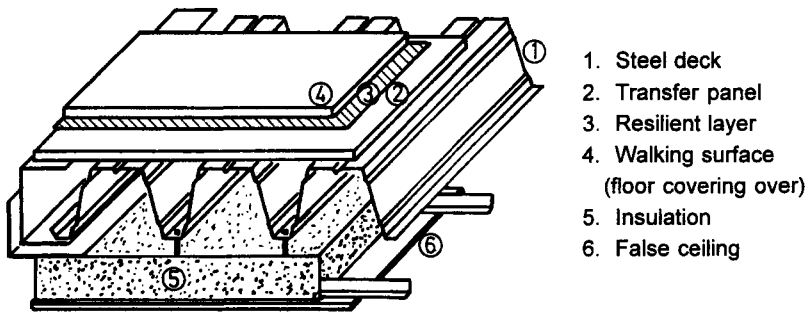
Typical internal structure of a dry floor on a steel deck, Engel (1998)
